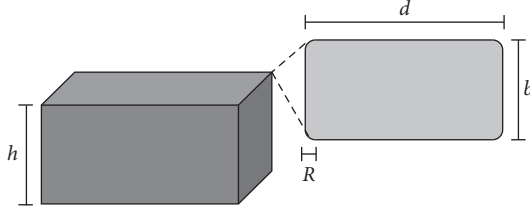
Dimensions of the test specimen with rectangular cross section.
